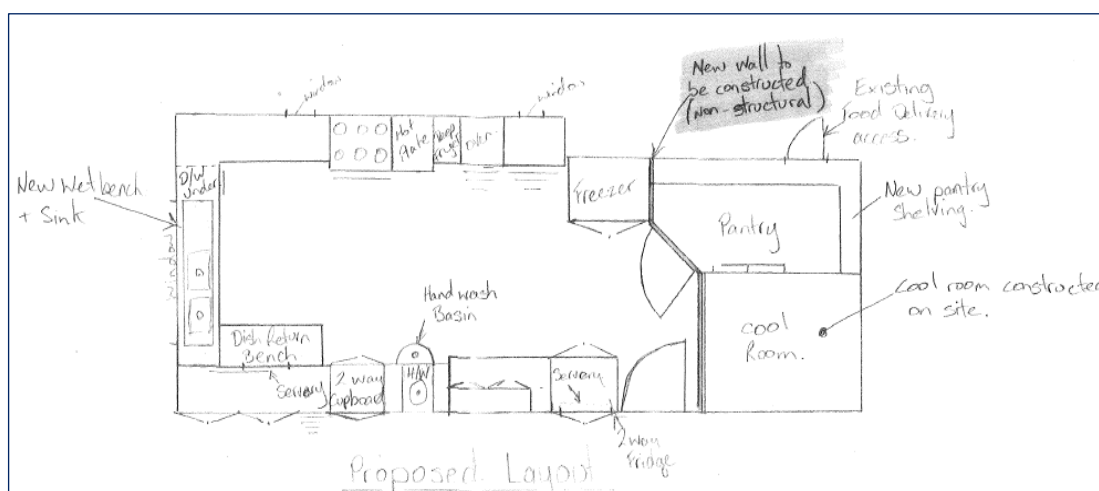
| Proposed kitchen and cool room layout (Source: Applicant's documentation)
